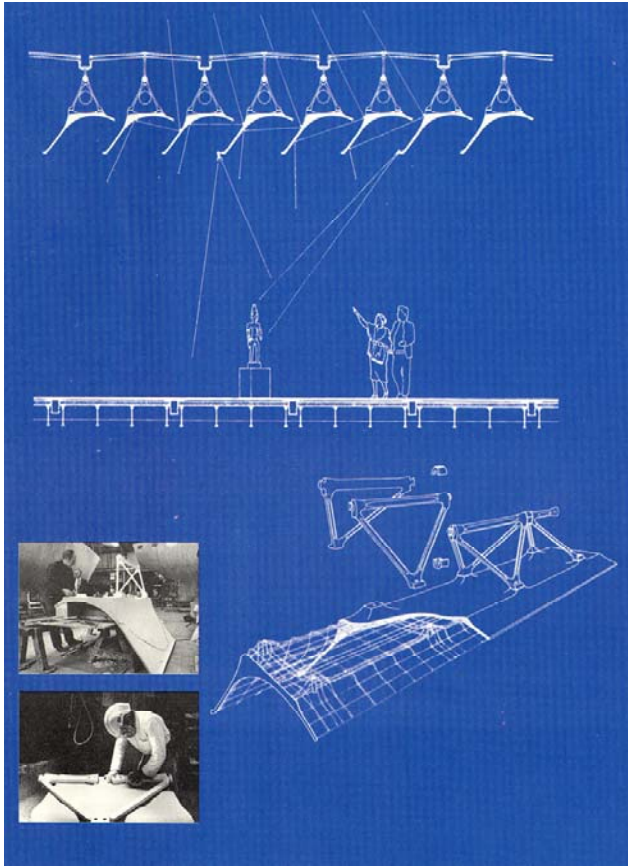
Menil Museum, roof section and diagram. (Piano, p.18)
